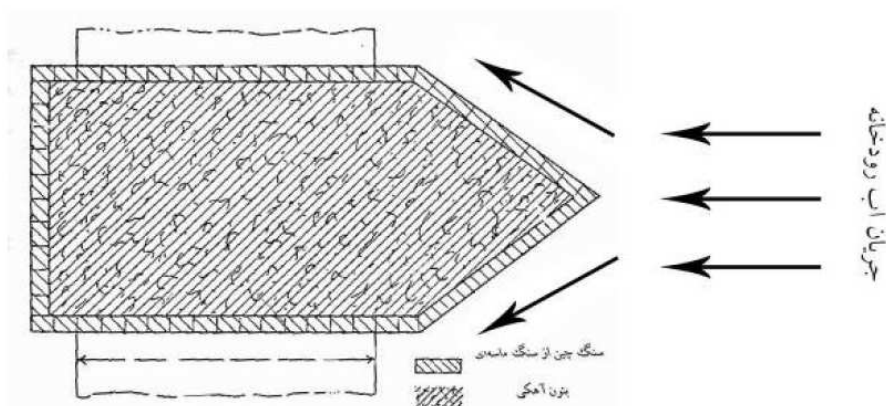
Cross section of one of the bridge pedestals with flow breaker (stabilizer)
